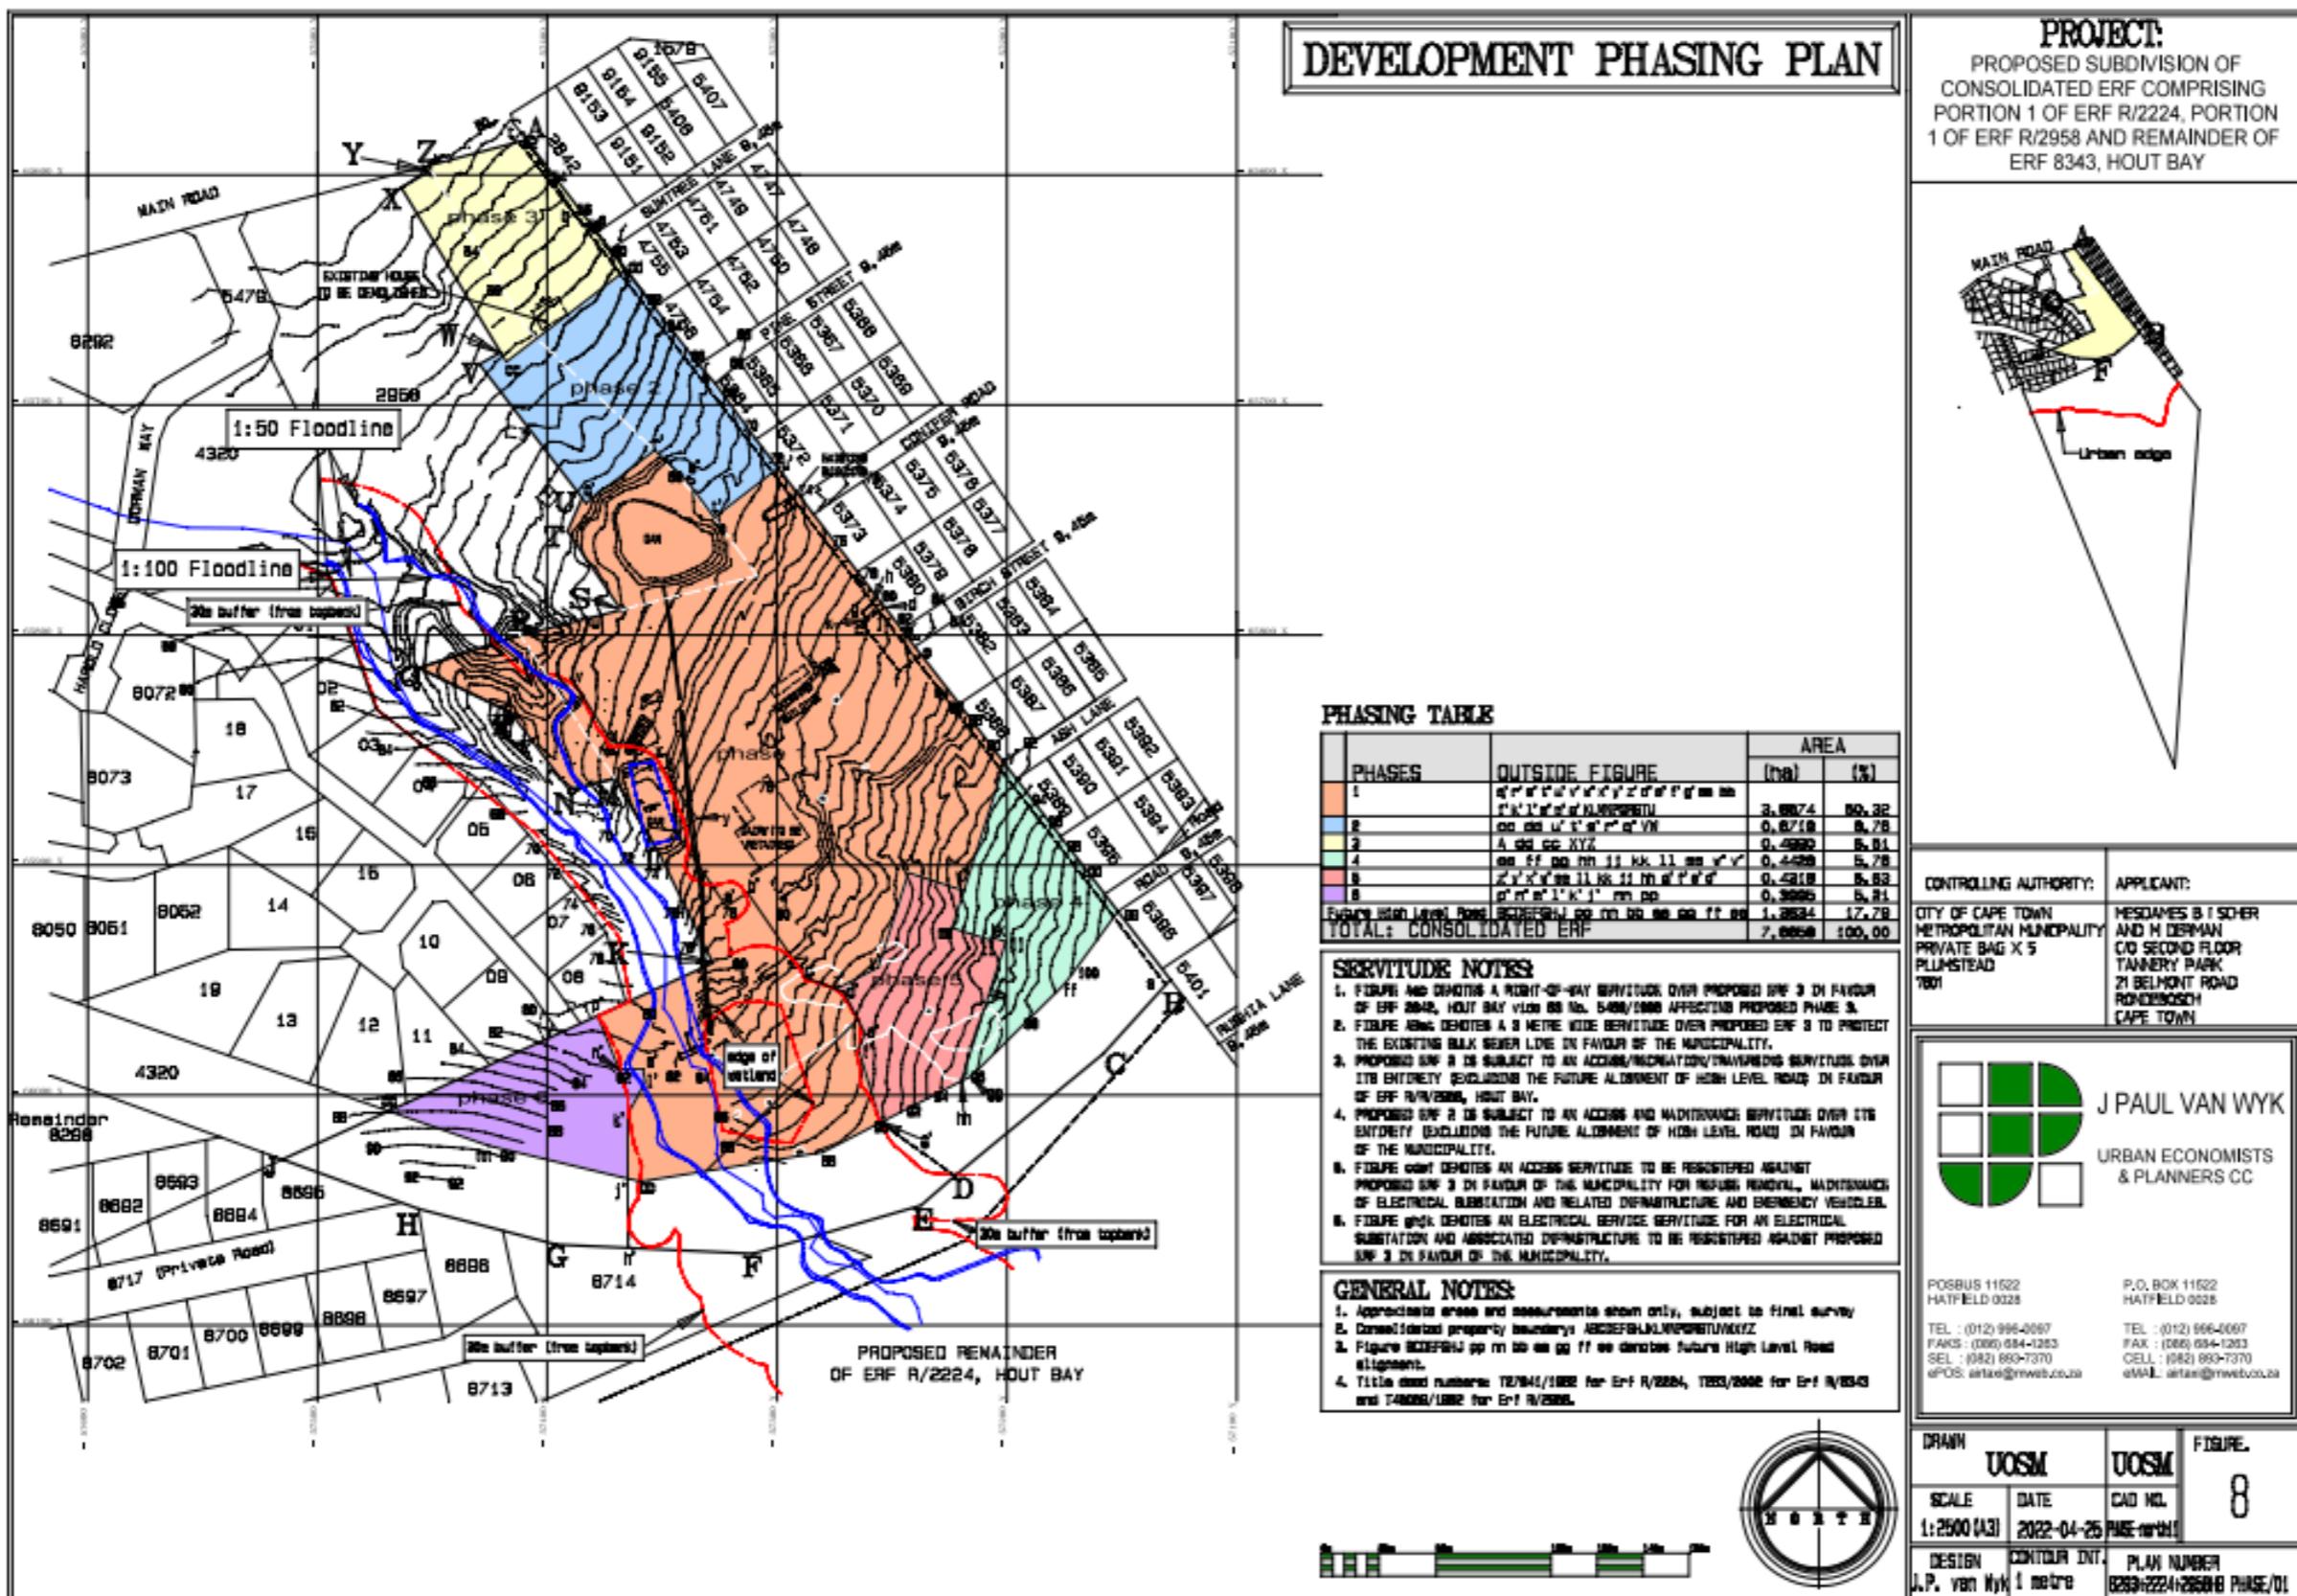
PROPOSED DEVELOPMENT PLAN PHASING PLAN, OAKHURST LIFESTYLE ESTATE, HOUT BAY
